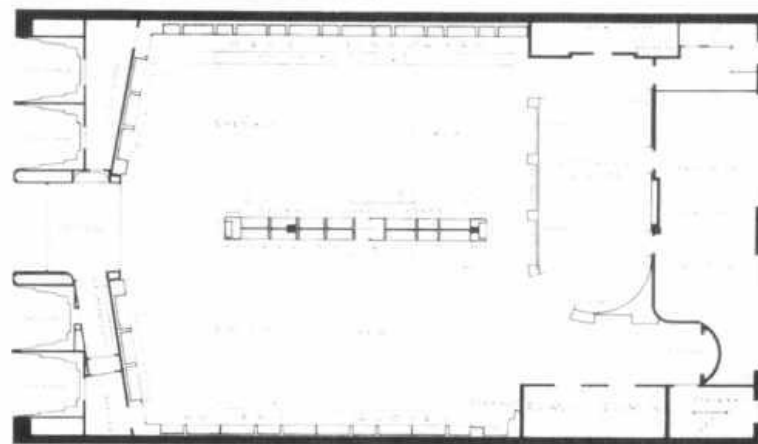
Portion of hotel guest section on the first floor. "Wall" features a color-treated pattern of mirror and a wood structure. Principal glass curtain wall shown.
